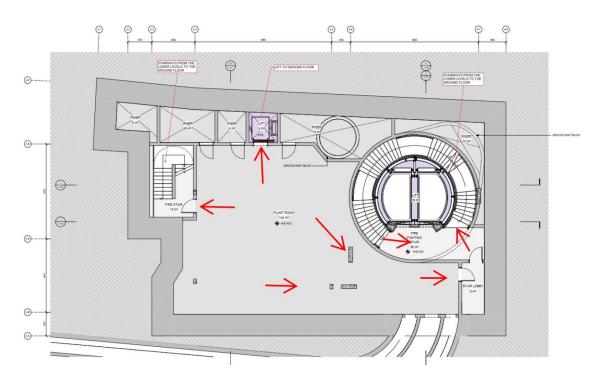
Furnival Street - Level B3 Evacuation Route Plan
